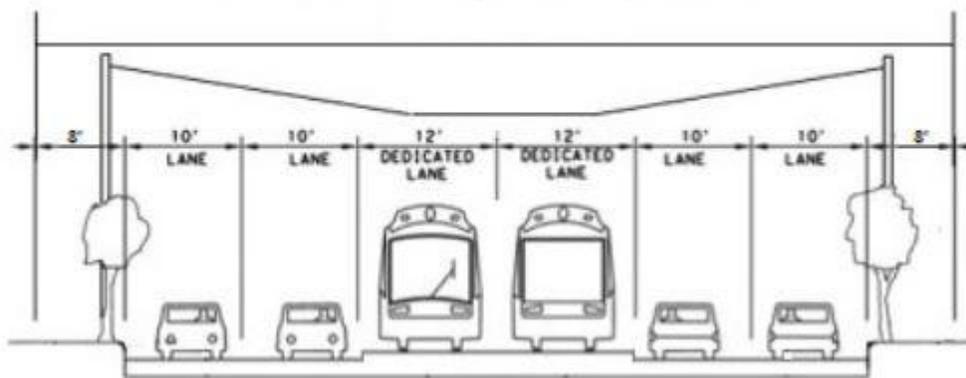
LRT alignment cross-section design for Austin's Guadalupe-Lamar corridor. (Graphic: Author)
